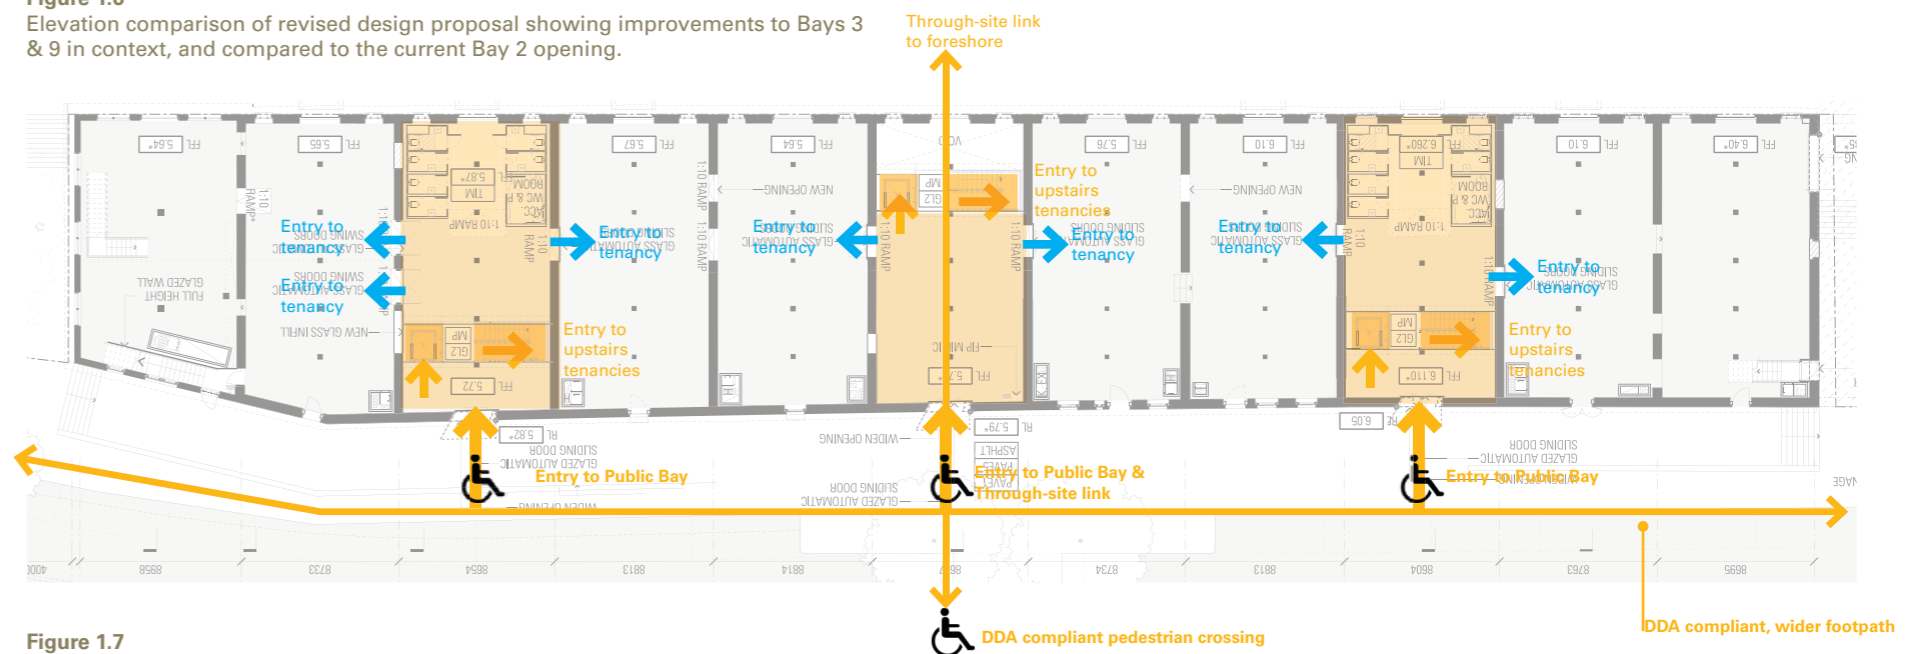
Hickson Road Level plan showing Wheelchair Access
